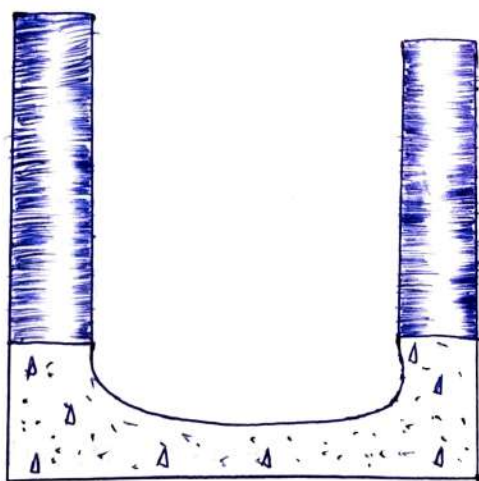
shows the Semi- Circular Section. It is constructed by casting plain cement concrete (1:3:6) in the
